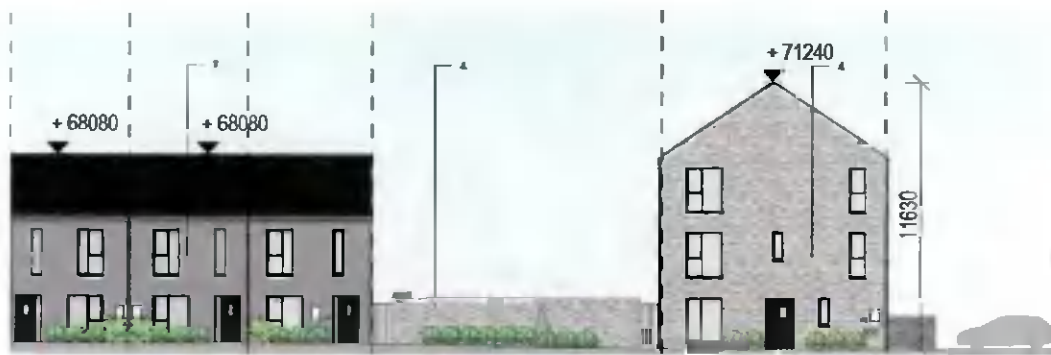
Extract from Design Statement prepared by MDO Architects showing form of proposed buildings as seen from Station Road.
